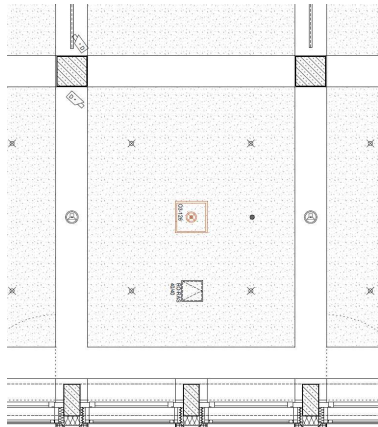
Excerpt from ceiling panel with inspection opening (panel 8)
